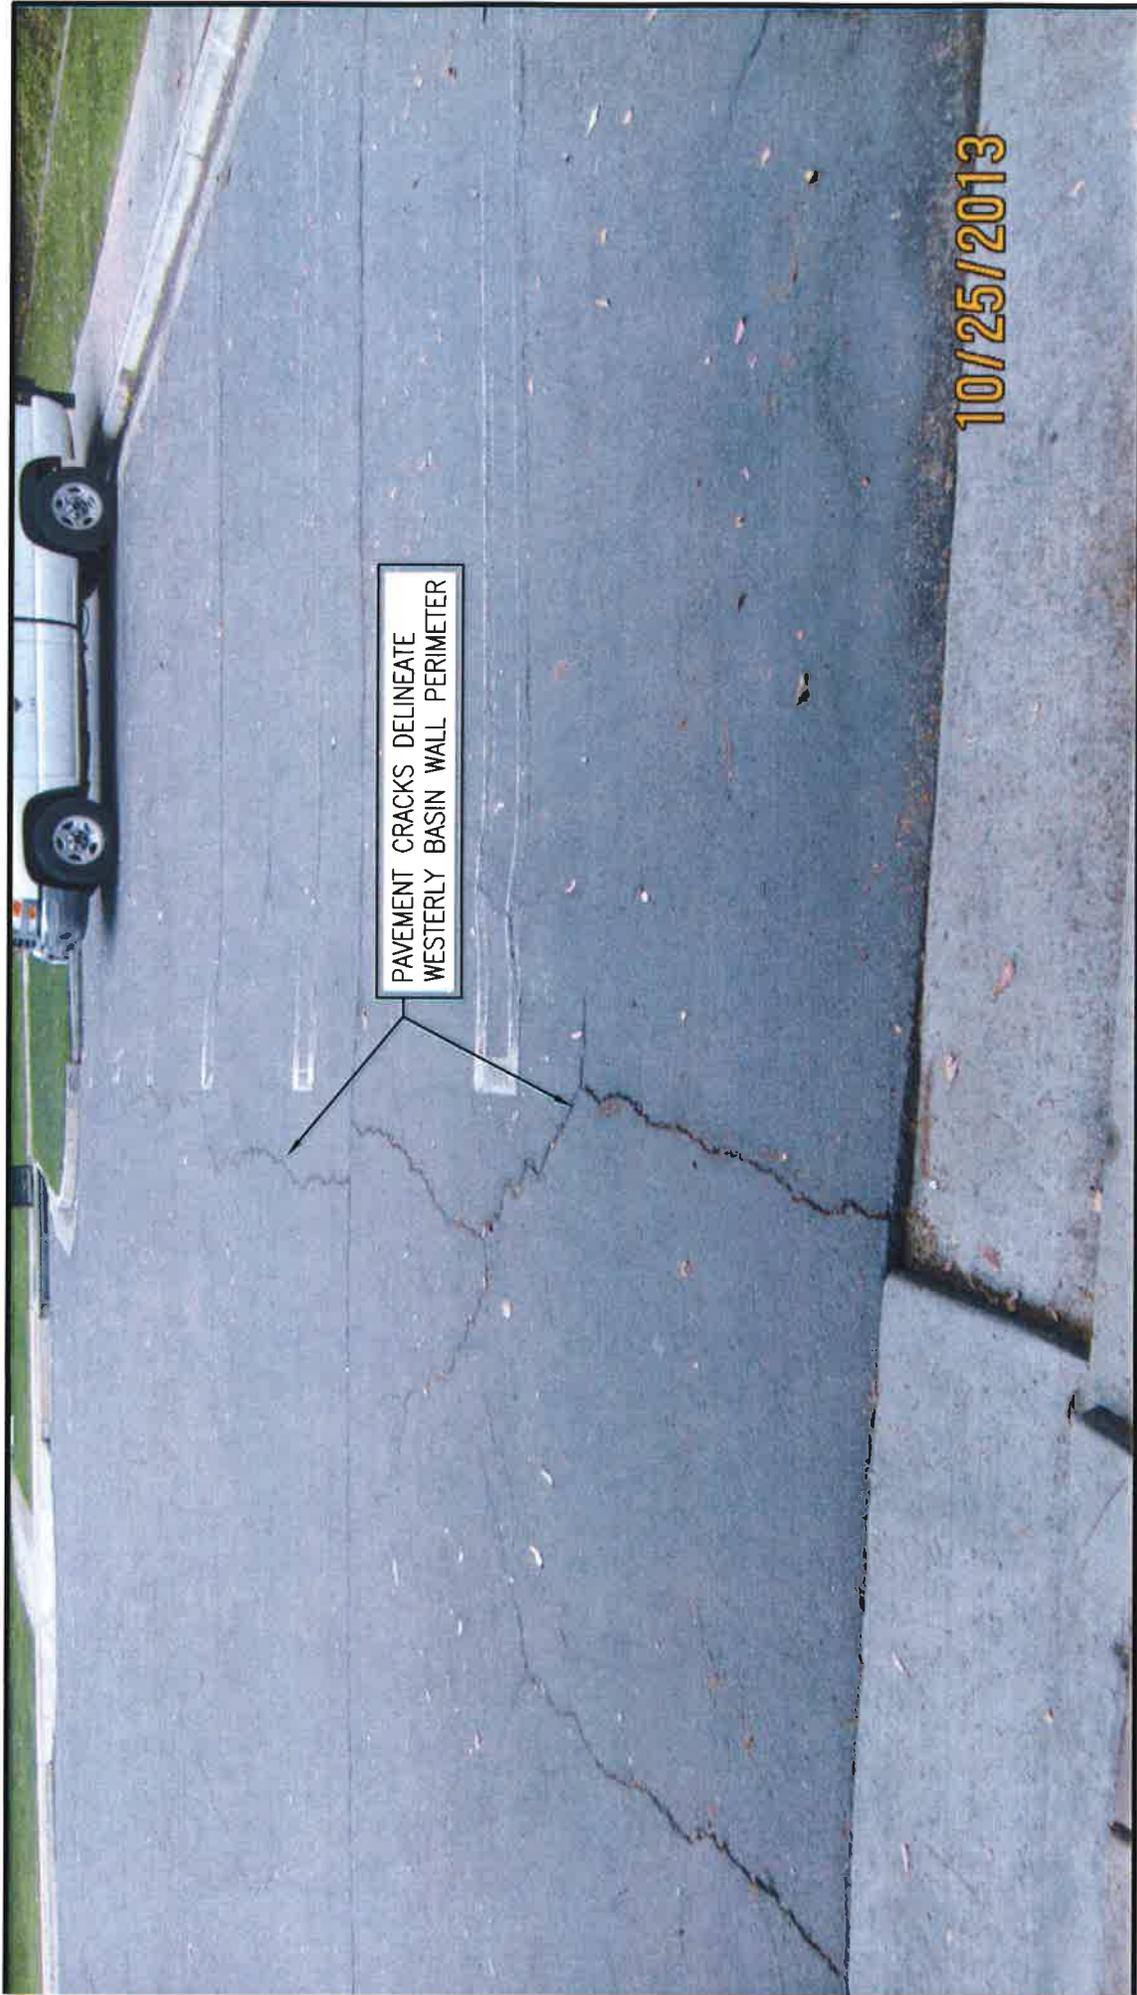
FIGURE J: PAVEMENT CRACKS AT WESTERLY BASIN WALL
